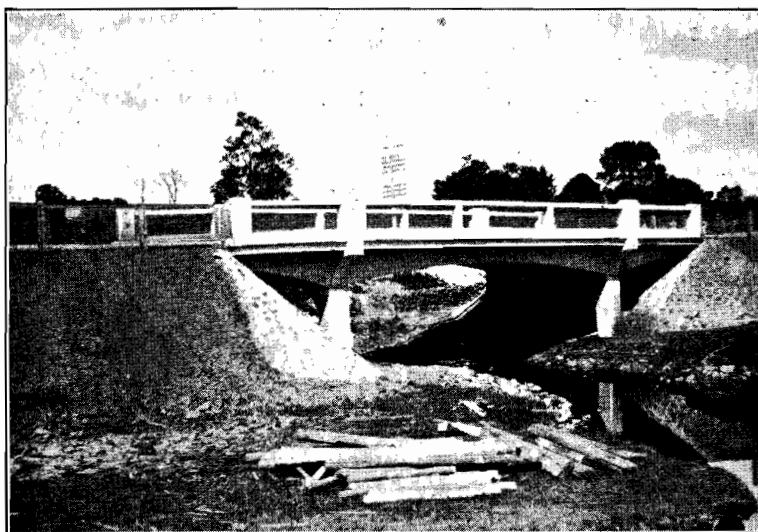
A.—Showing bridge erected over Paddock Creek on the Western Highway near Ballan.
